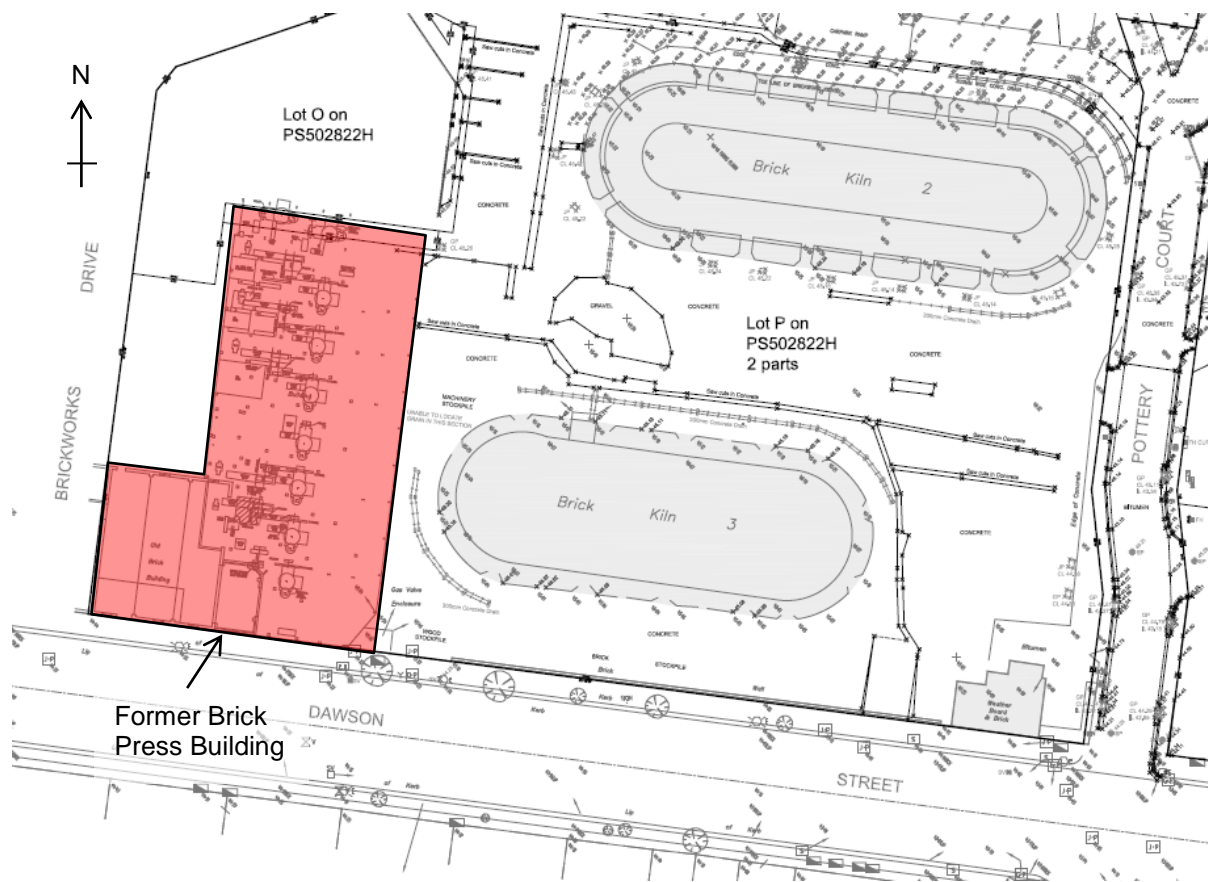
Hoffman Brickworks - Site Key Plan
